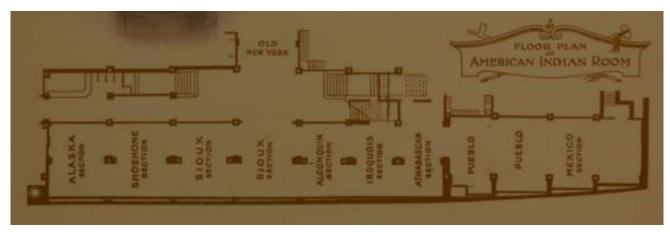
Floor Plan, Indian Hall, Hotel Astor (1905). The guest entrance to the dining room was through the Old New York section in the center; staff came and went through the doors in the Athabascan section, which led to the "world's largest kitchen."
